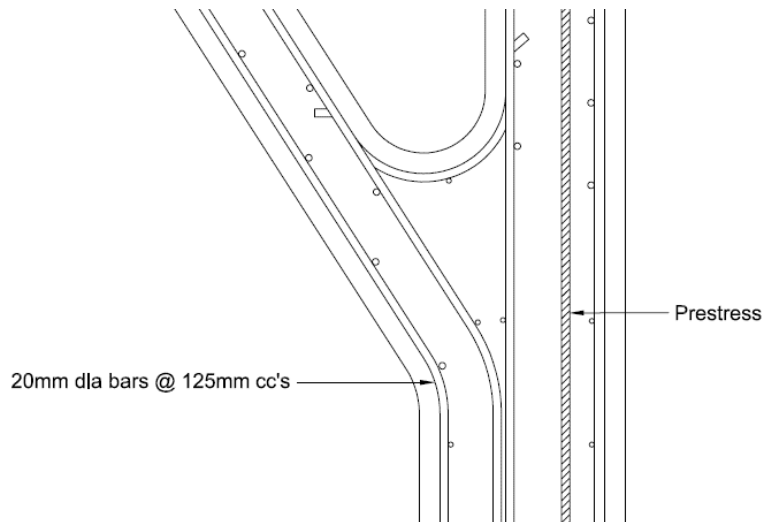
Reinforcement requirements at junction between base column and cone section
